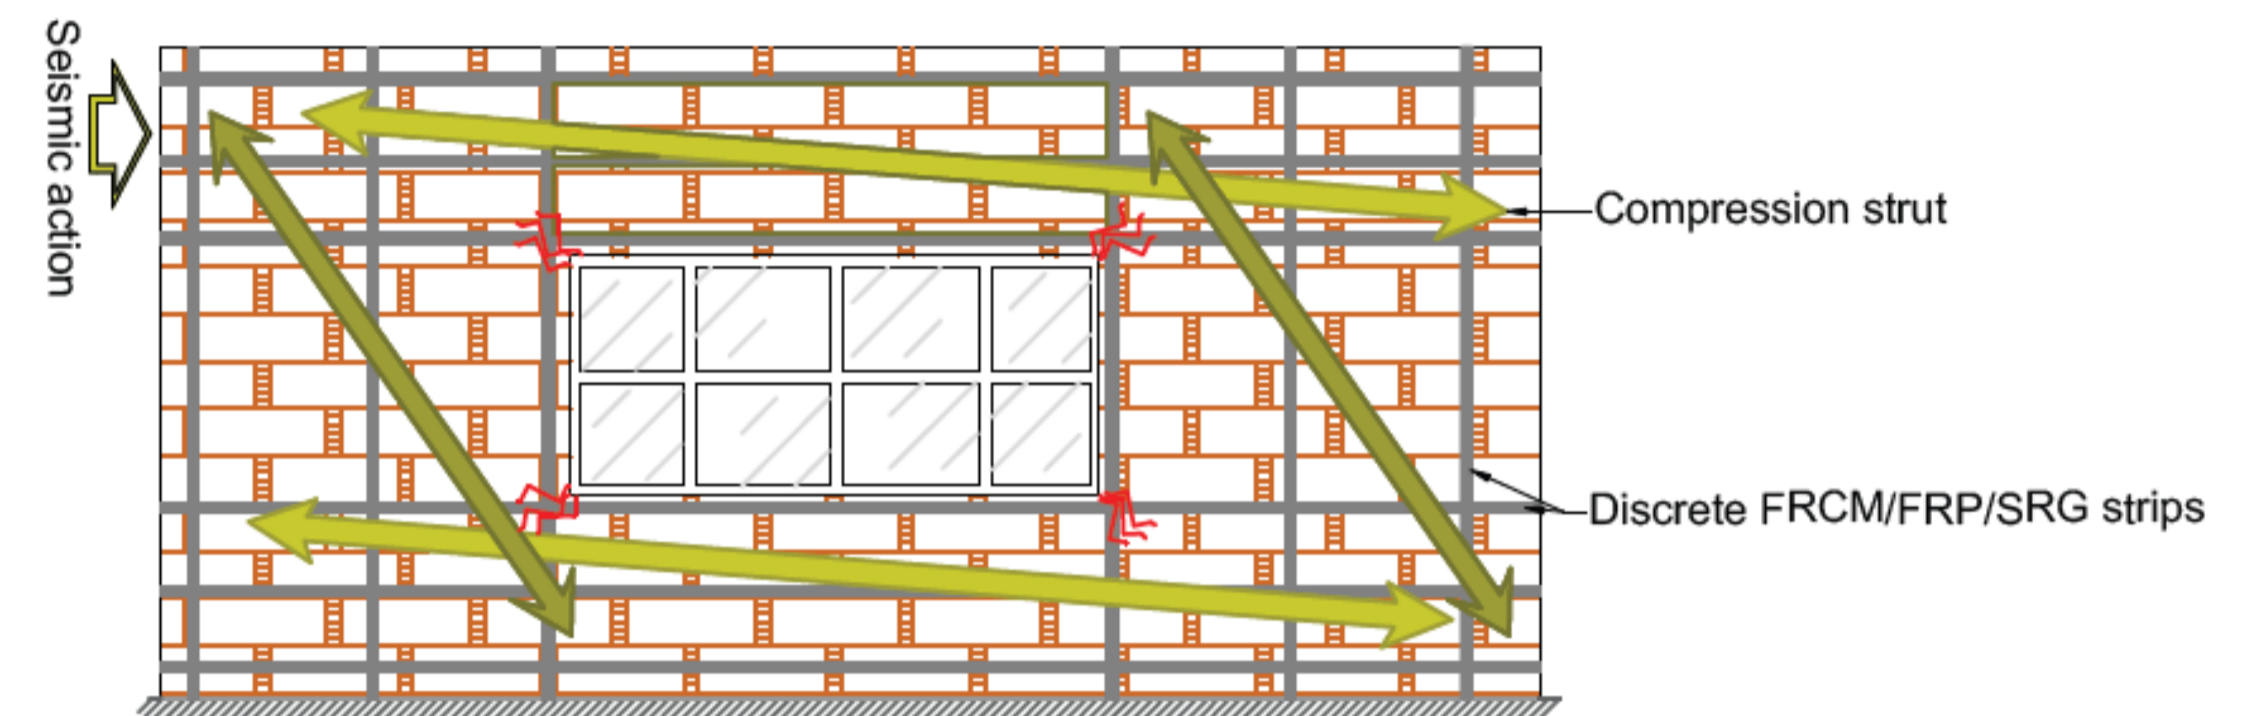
Strut-and-tie-model for the in-plane reinforcement of masonry walls with opening.
